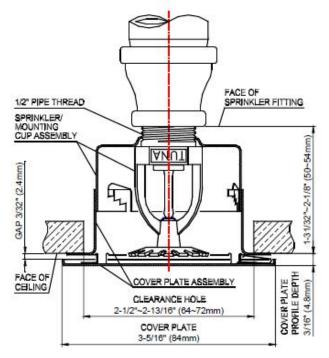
FIGURE E: MODEL NX007/NX008 CONCEALED PENDENT SPRINKLER TYPICAL INSTALLATION
